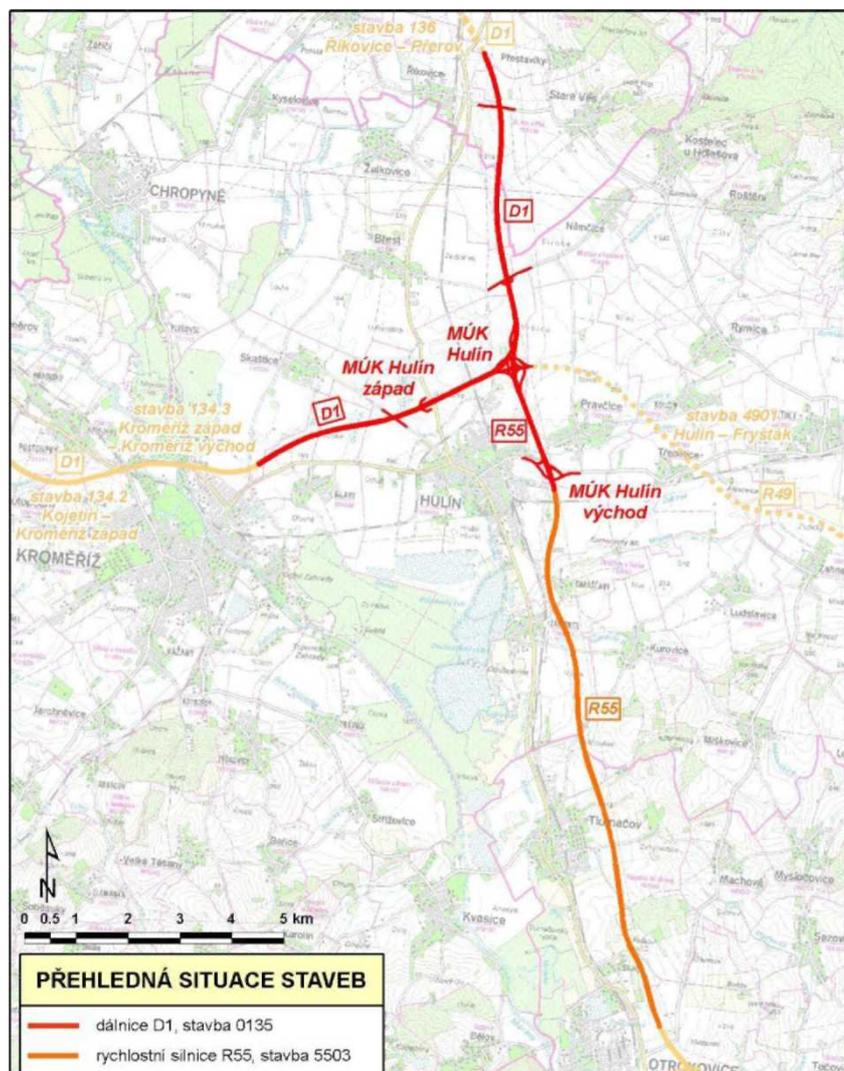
Layout of constructions 0135 and 5503 and plans adjoined thereto.
